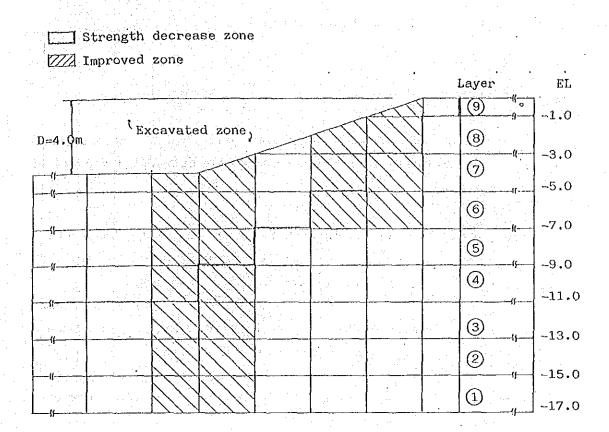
Strength Decrease Zone and Improved Zone by Soil Cement Columns
